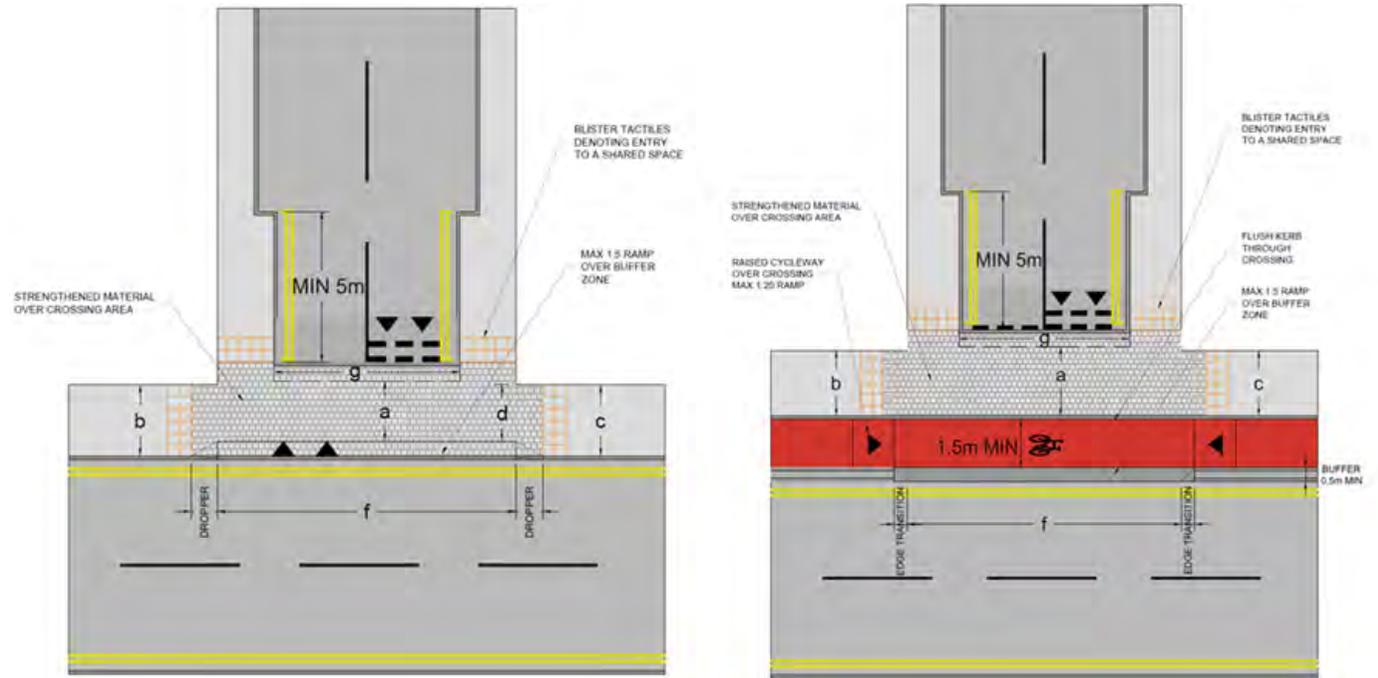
Schematic layout of continuous footway both with and without a cycleway.
